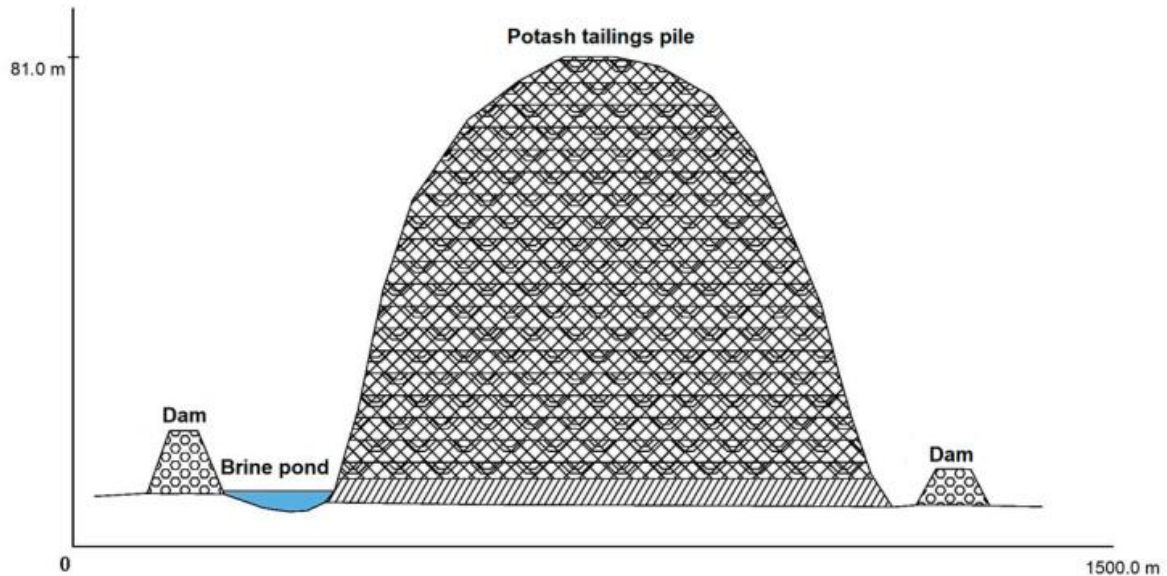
Schematic cross-section of a potash tailings pile with brine pond and protective dams
